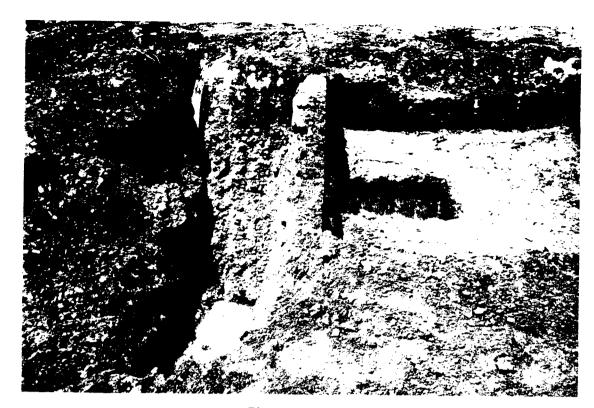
Area D Looking South, Initial Excavation East Sump
